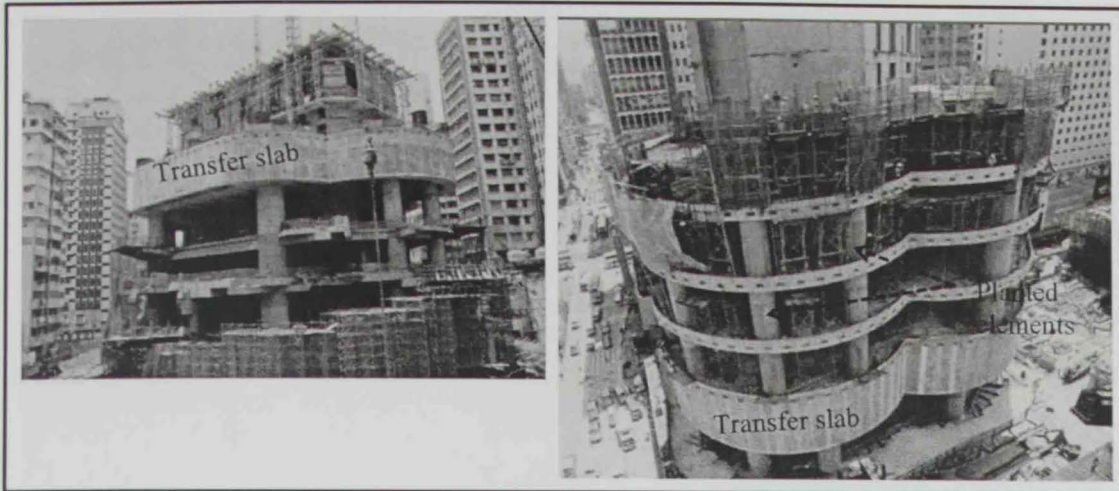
Four meters thick transfer plate supporting an office tower of Langham Place - building 9 (Wong, 2013)
